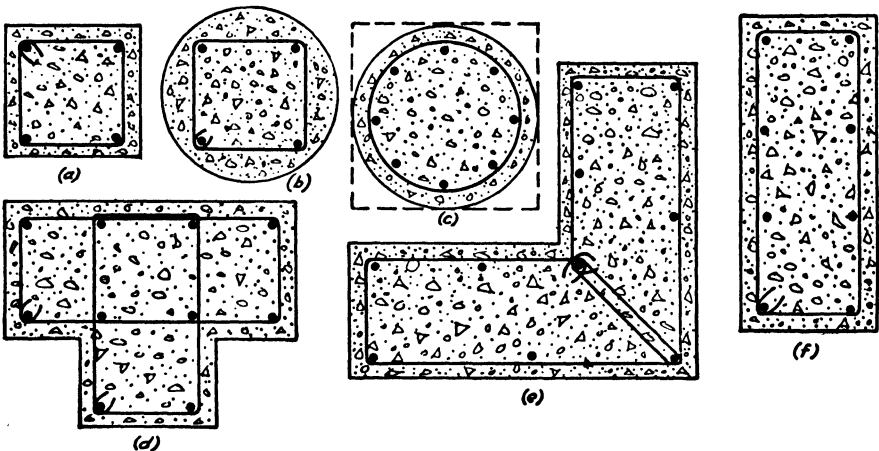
Reinforced Concrete Columns. (a)&(b) vertical steel and ties; (c) vertical steel and hoops; (d),(e)&(f) exterior columns with vertical steel and ties.
